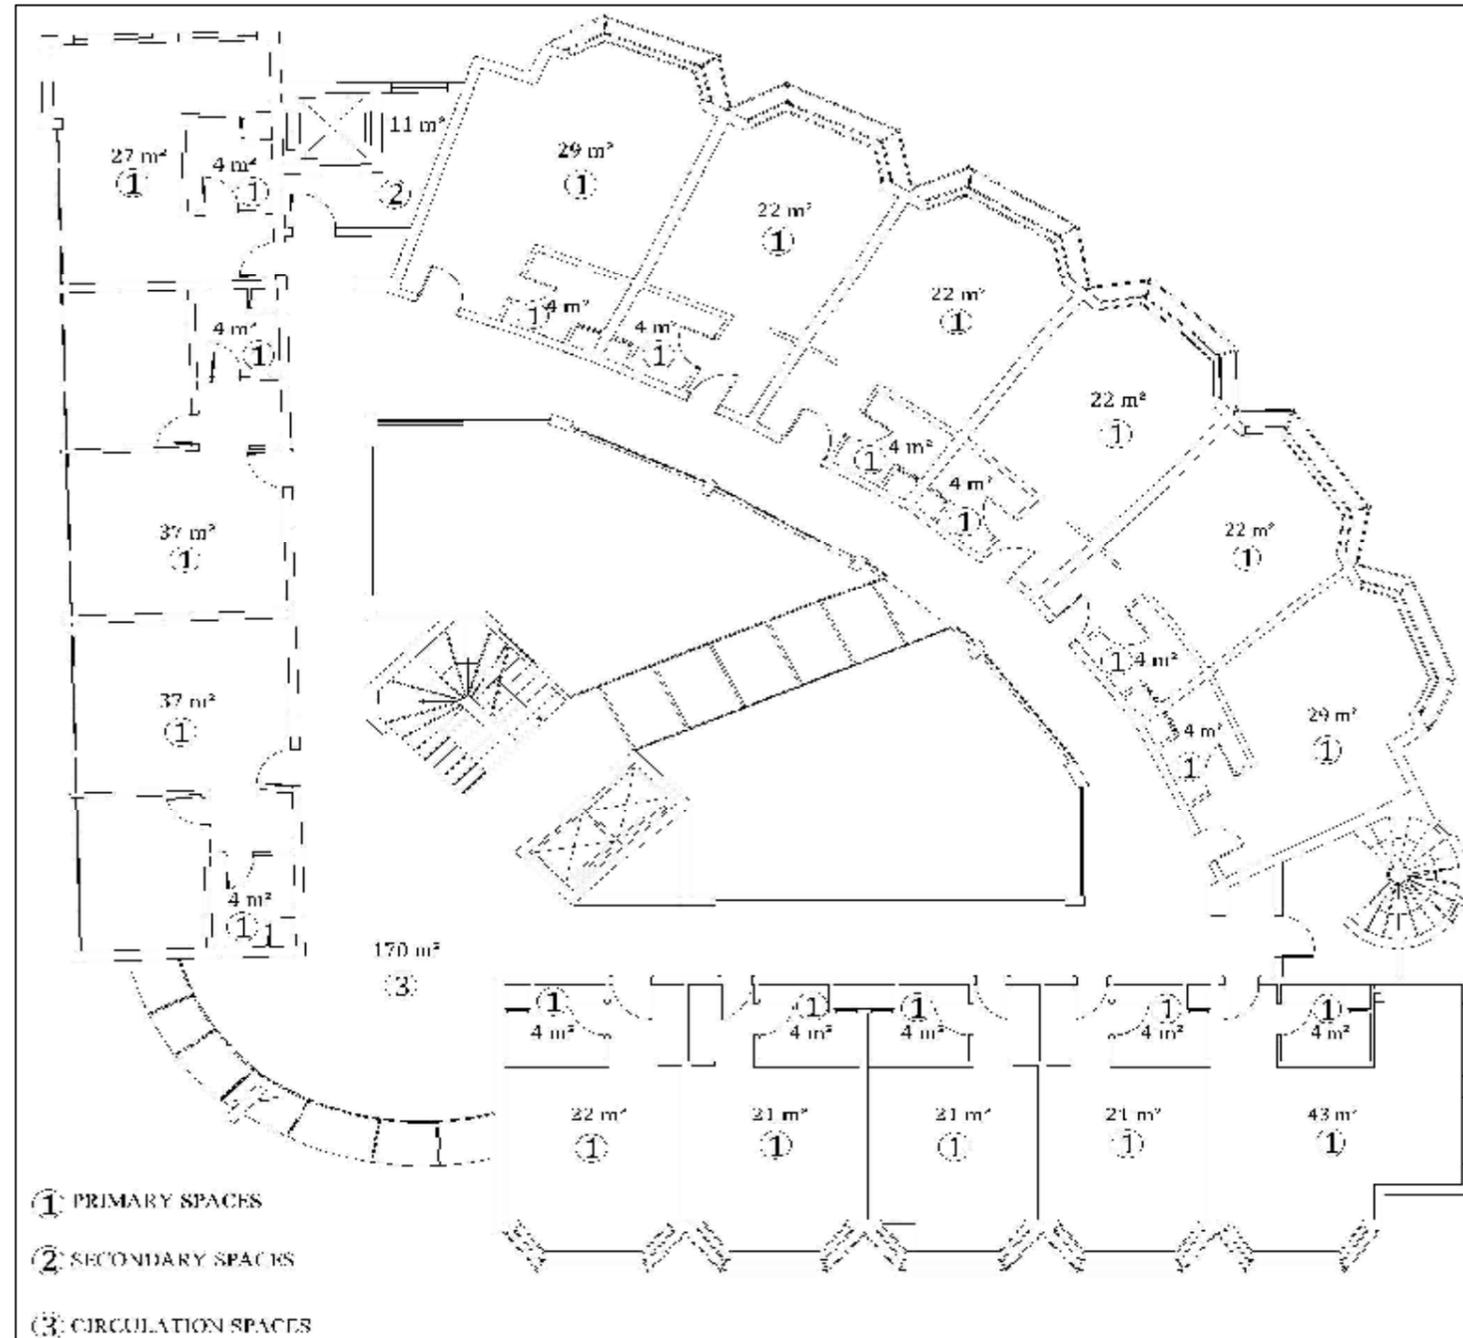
Floor plan of Sample 06 (S06) displaying, primary, secondary and circulation spaces.
